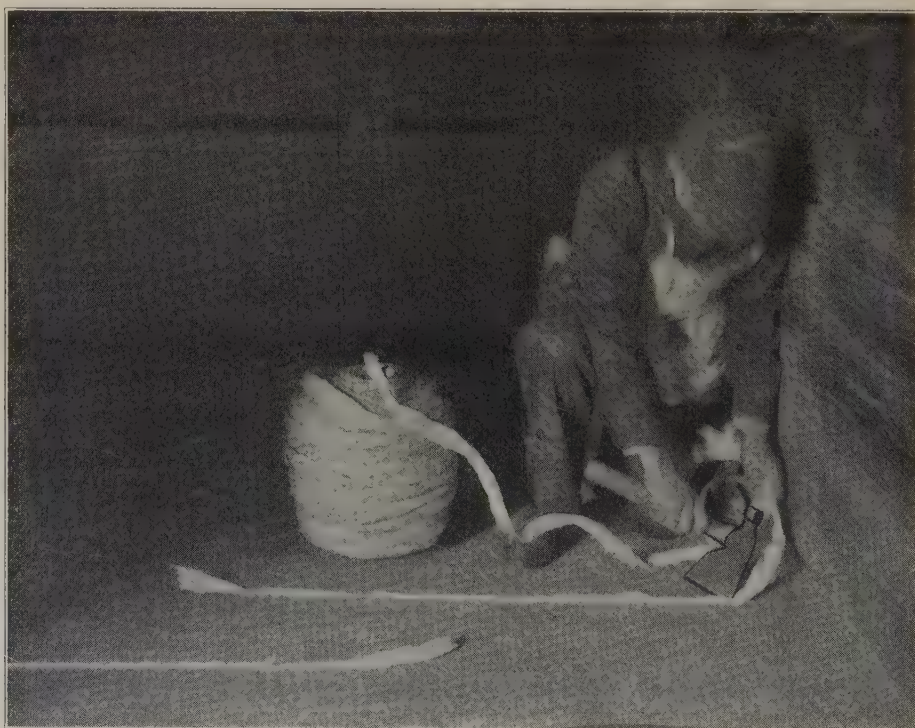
Calk all Cracks in Floors Between Boards with Calking Paper. [See facing page.]
